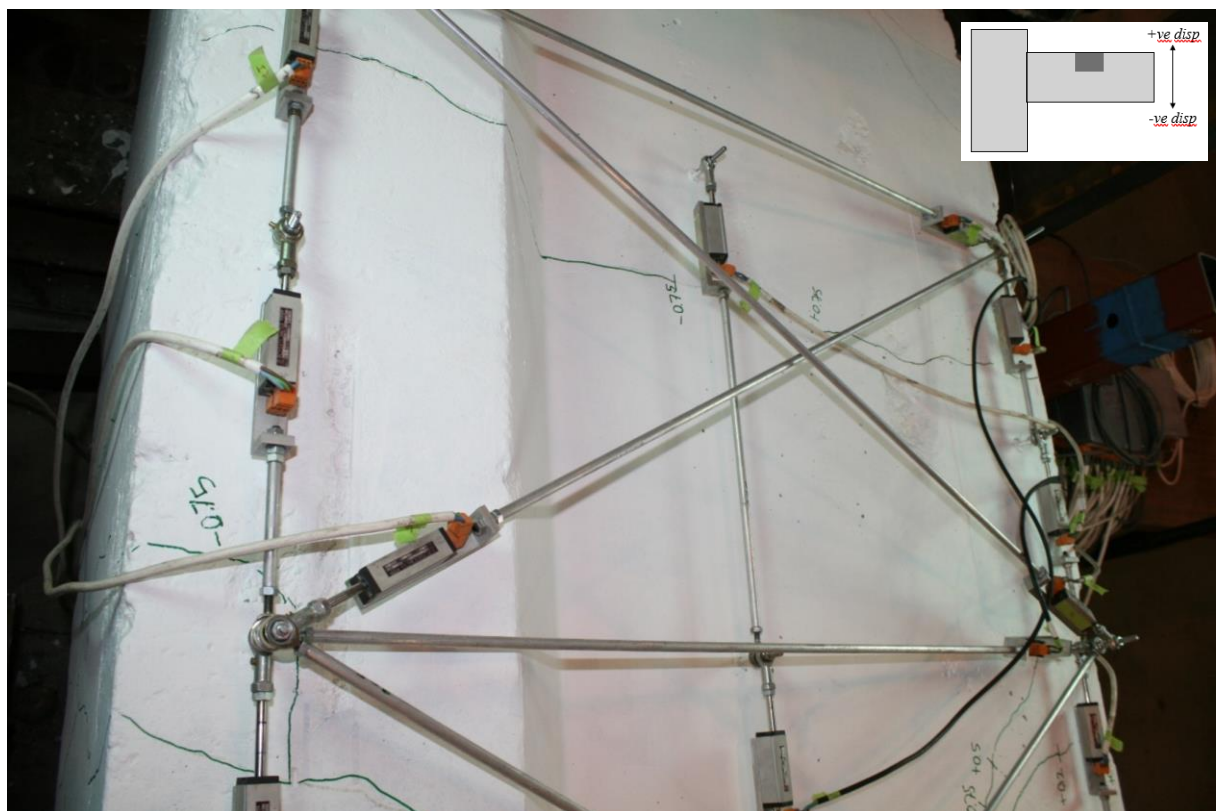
Crack developing outside the plastic hinge relocation detail, PHRD, at 0.75% beam rotation
